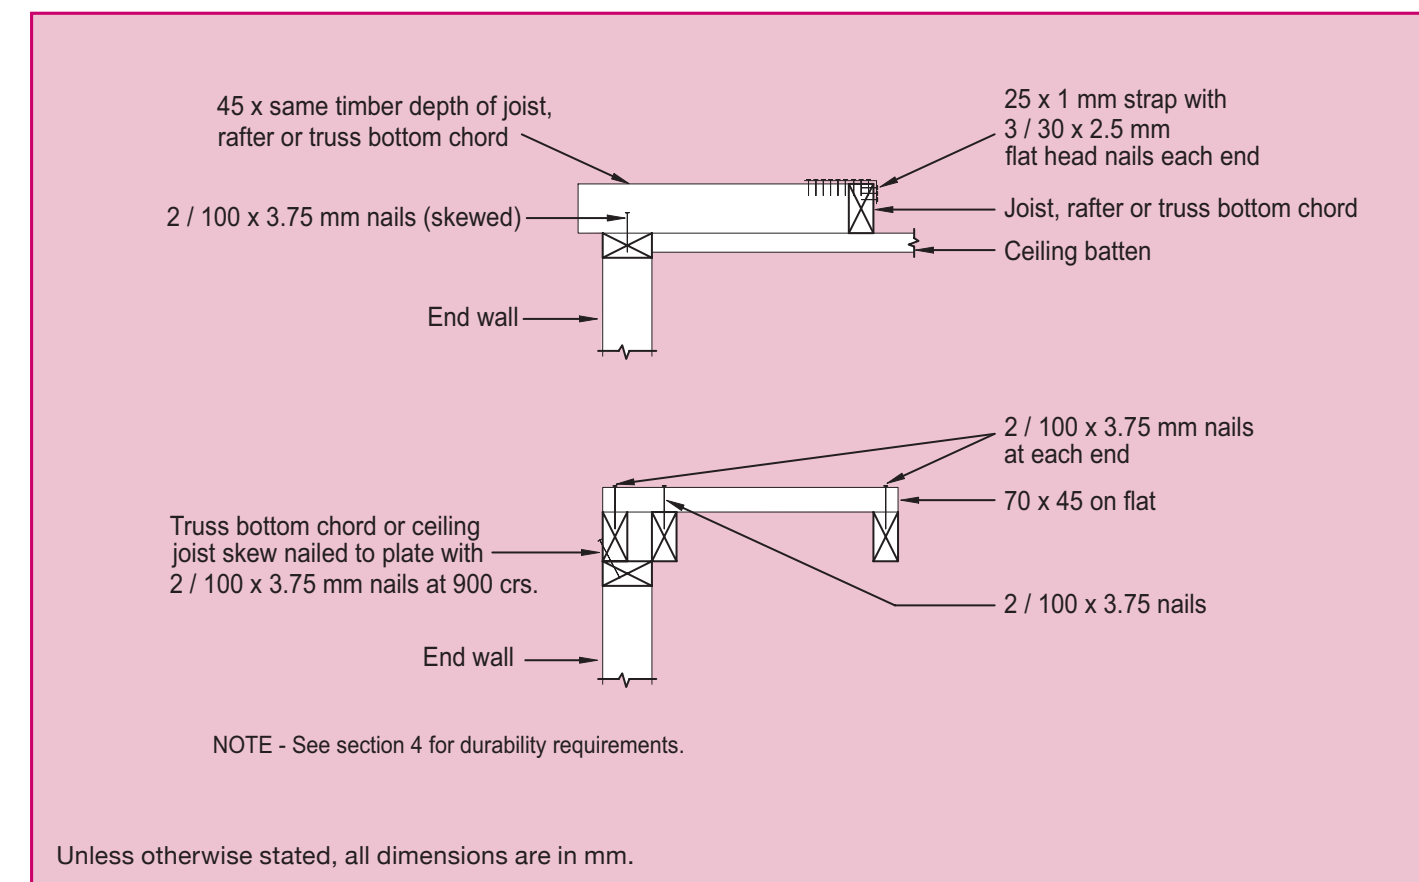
Connecting members providing lateral support to top plates (see 8.7.4.1)
